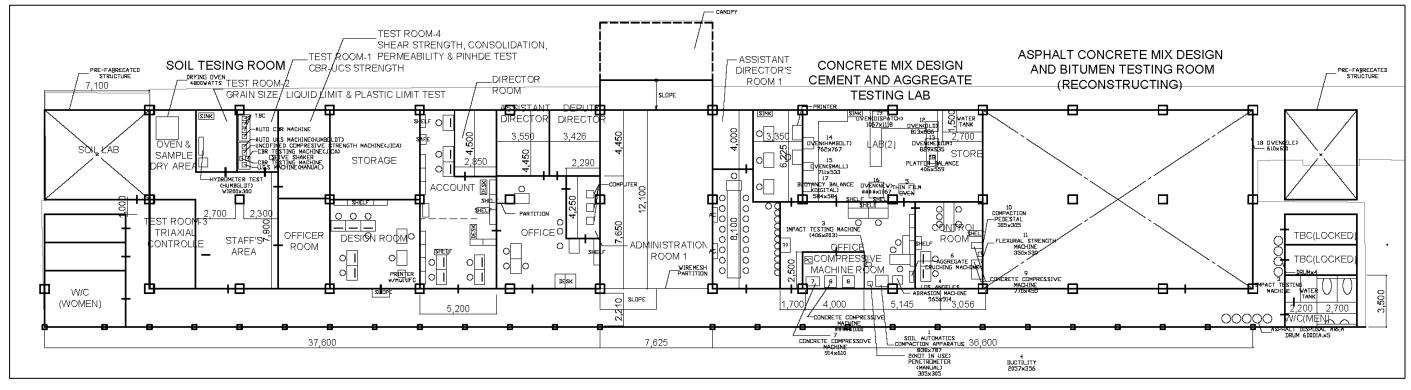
Survey Drawing of Existing Building of RDS Research and Testing Facilities
